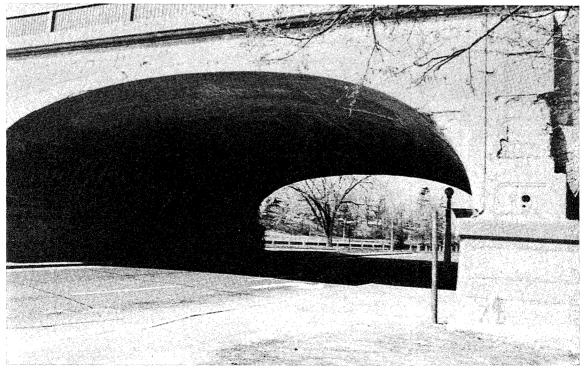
A detail of the bridge shown in Fig. 1. All the concrete on arches as well as on the front faces of the spans was to be removed to the depth of up to 100 mm.
